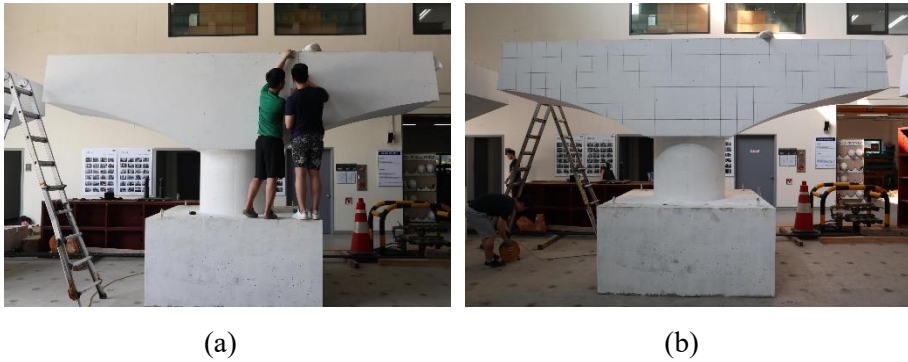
Grid on surface of specimens: (a) Grid work; (b) View of grid
